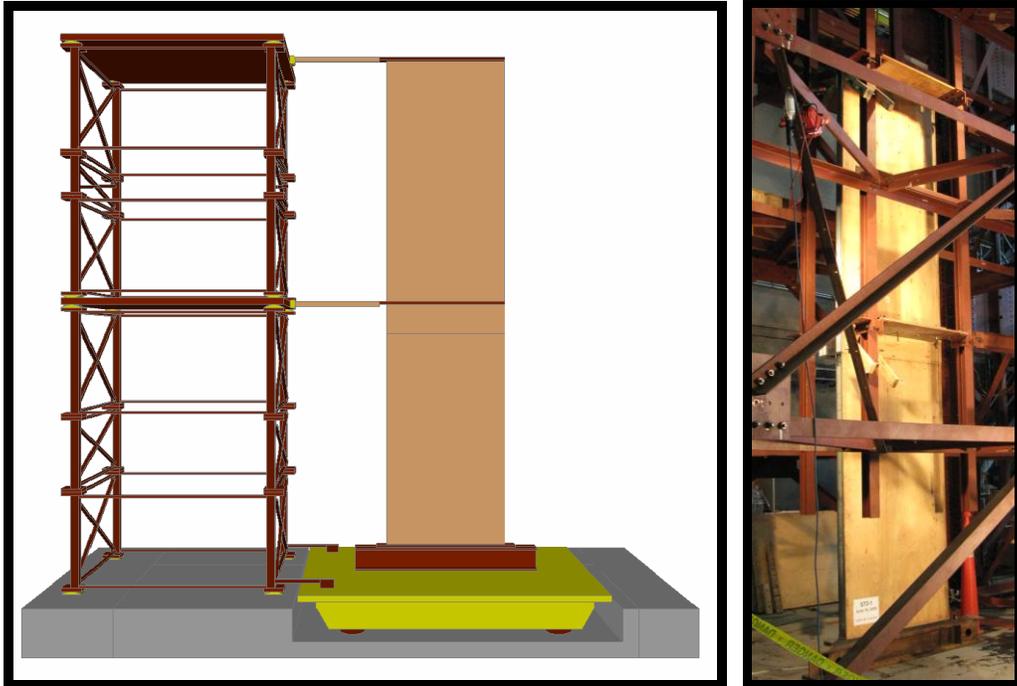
Two storey wood sheathed / CFS framed shear wall dynamic test assembly.
